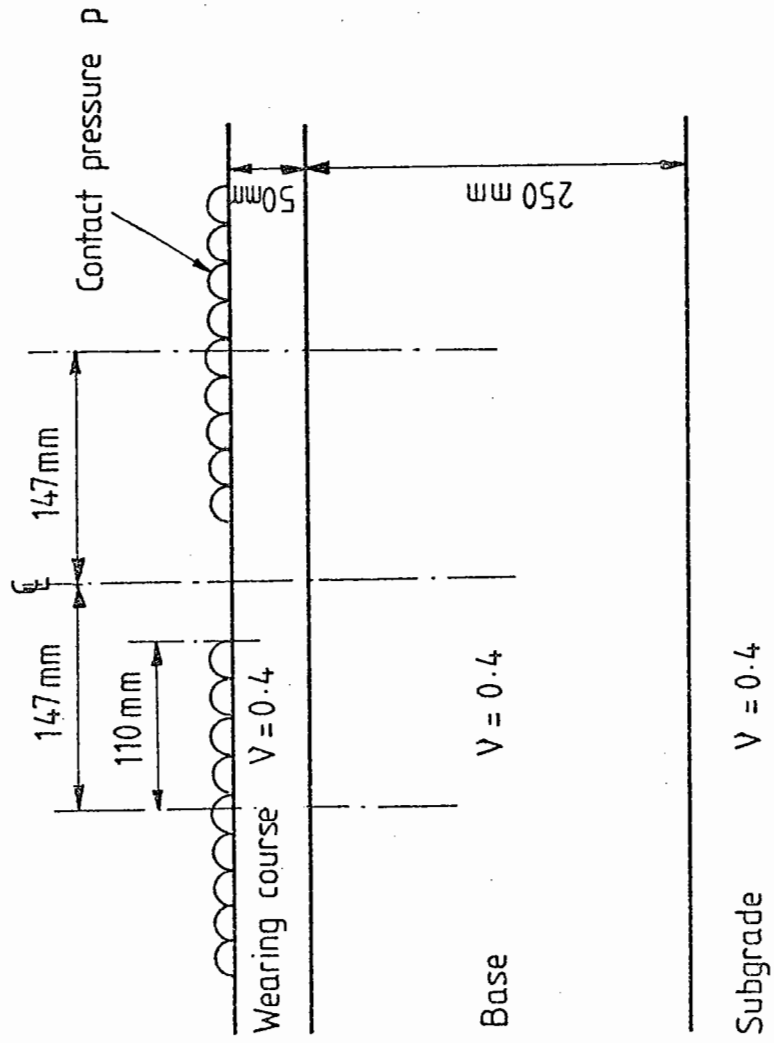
PAVEMENT STRUCTURE AND LOADING ARRANGEMENT FOR FLEXIBLE ROAD
